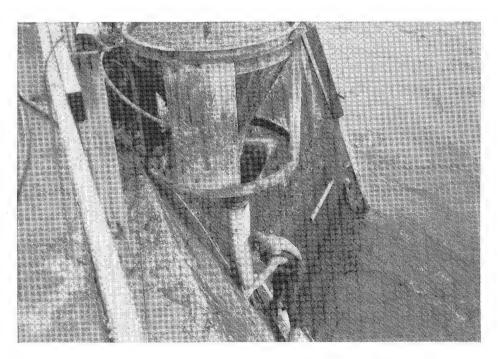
Infill concrete placement and consolidation on river wall, Troy Lock (from Miles 1993)
